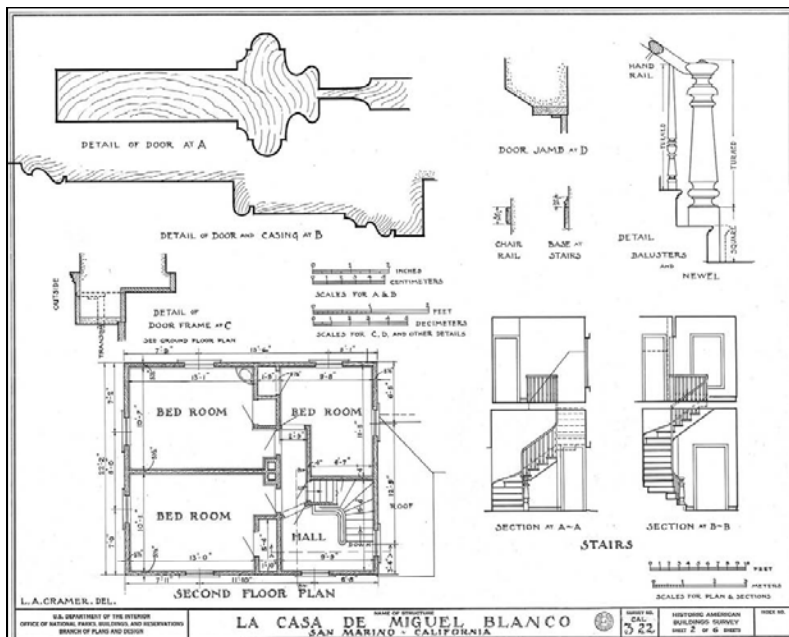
Drawing of "Second Floor Plan" (Historic American Building Survey, 1936)
